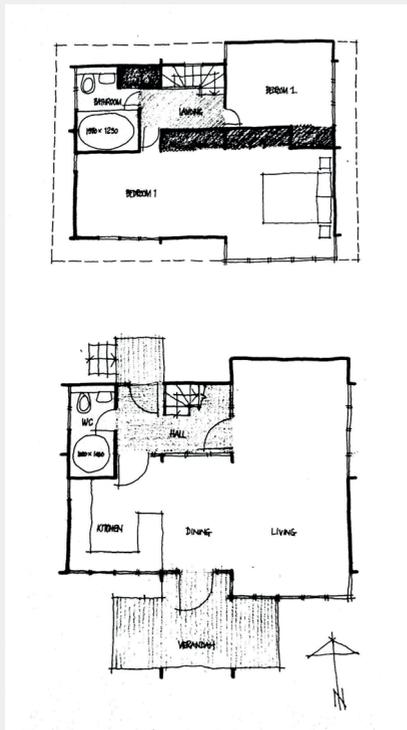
Plans Of Two Different Houses In Walters Way, London
